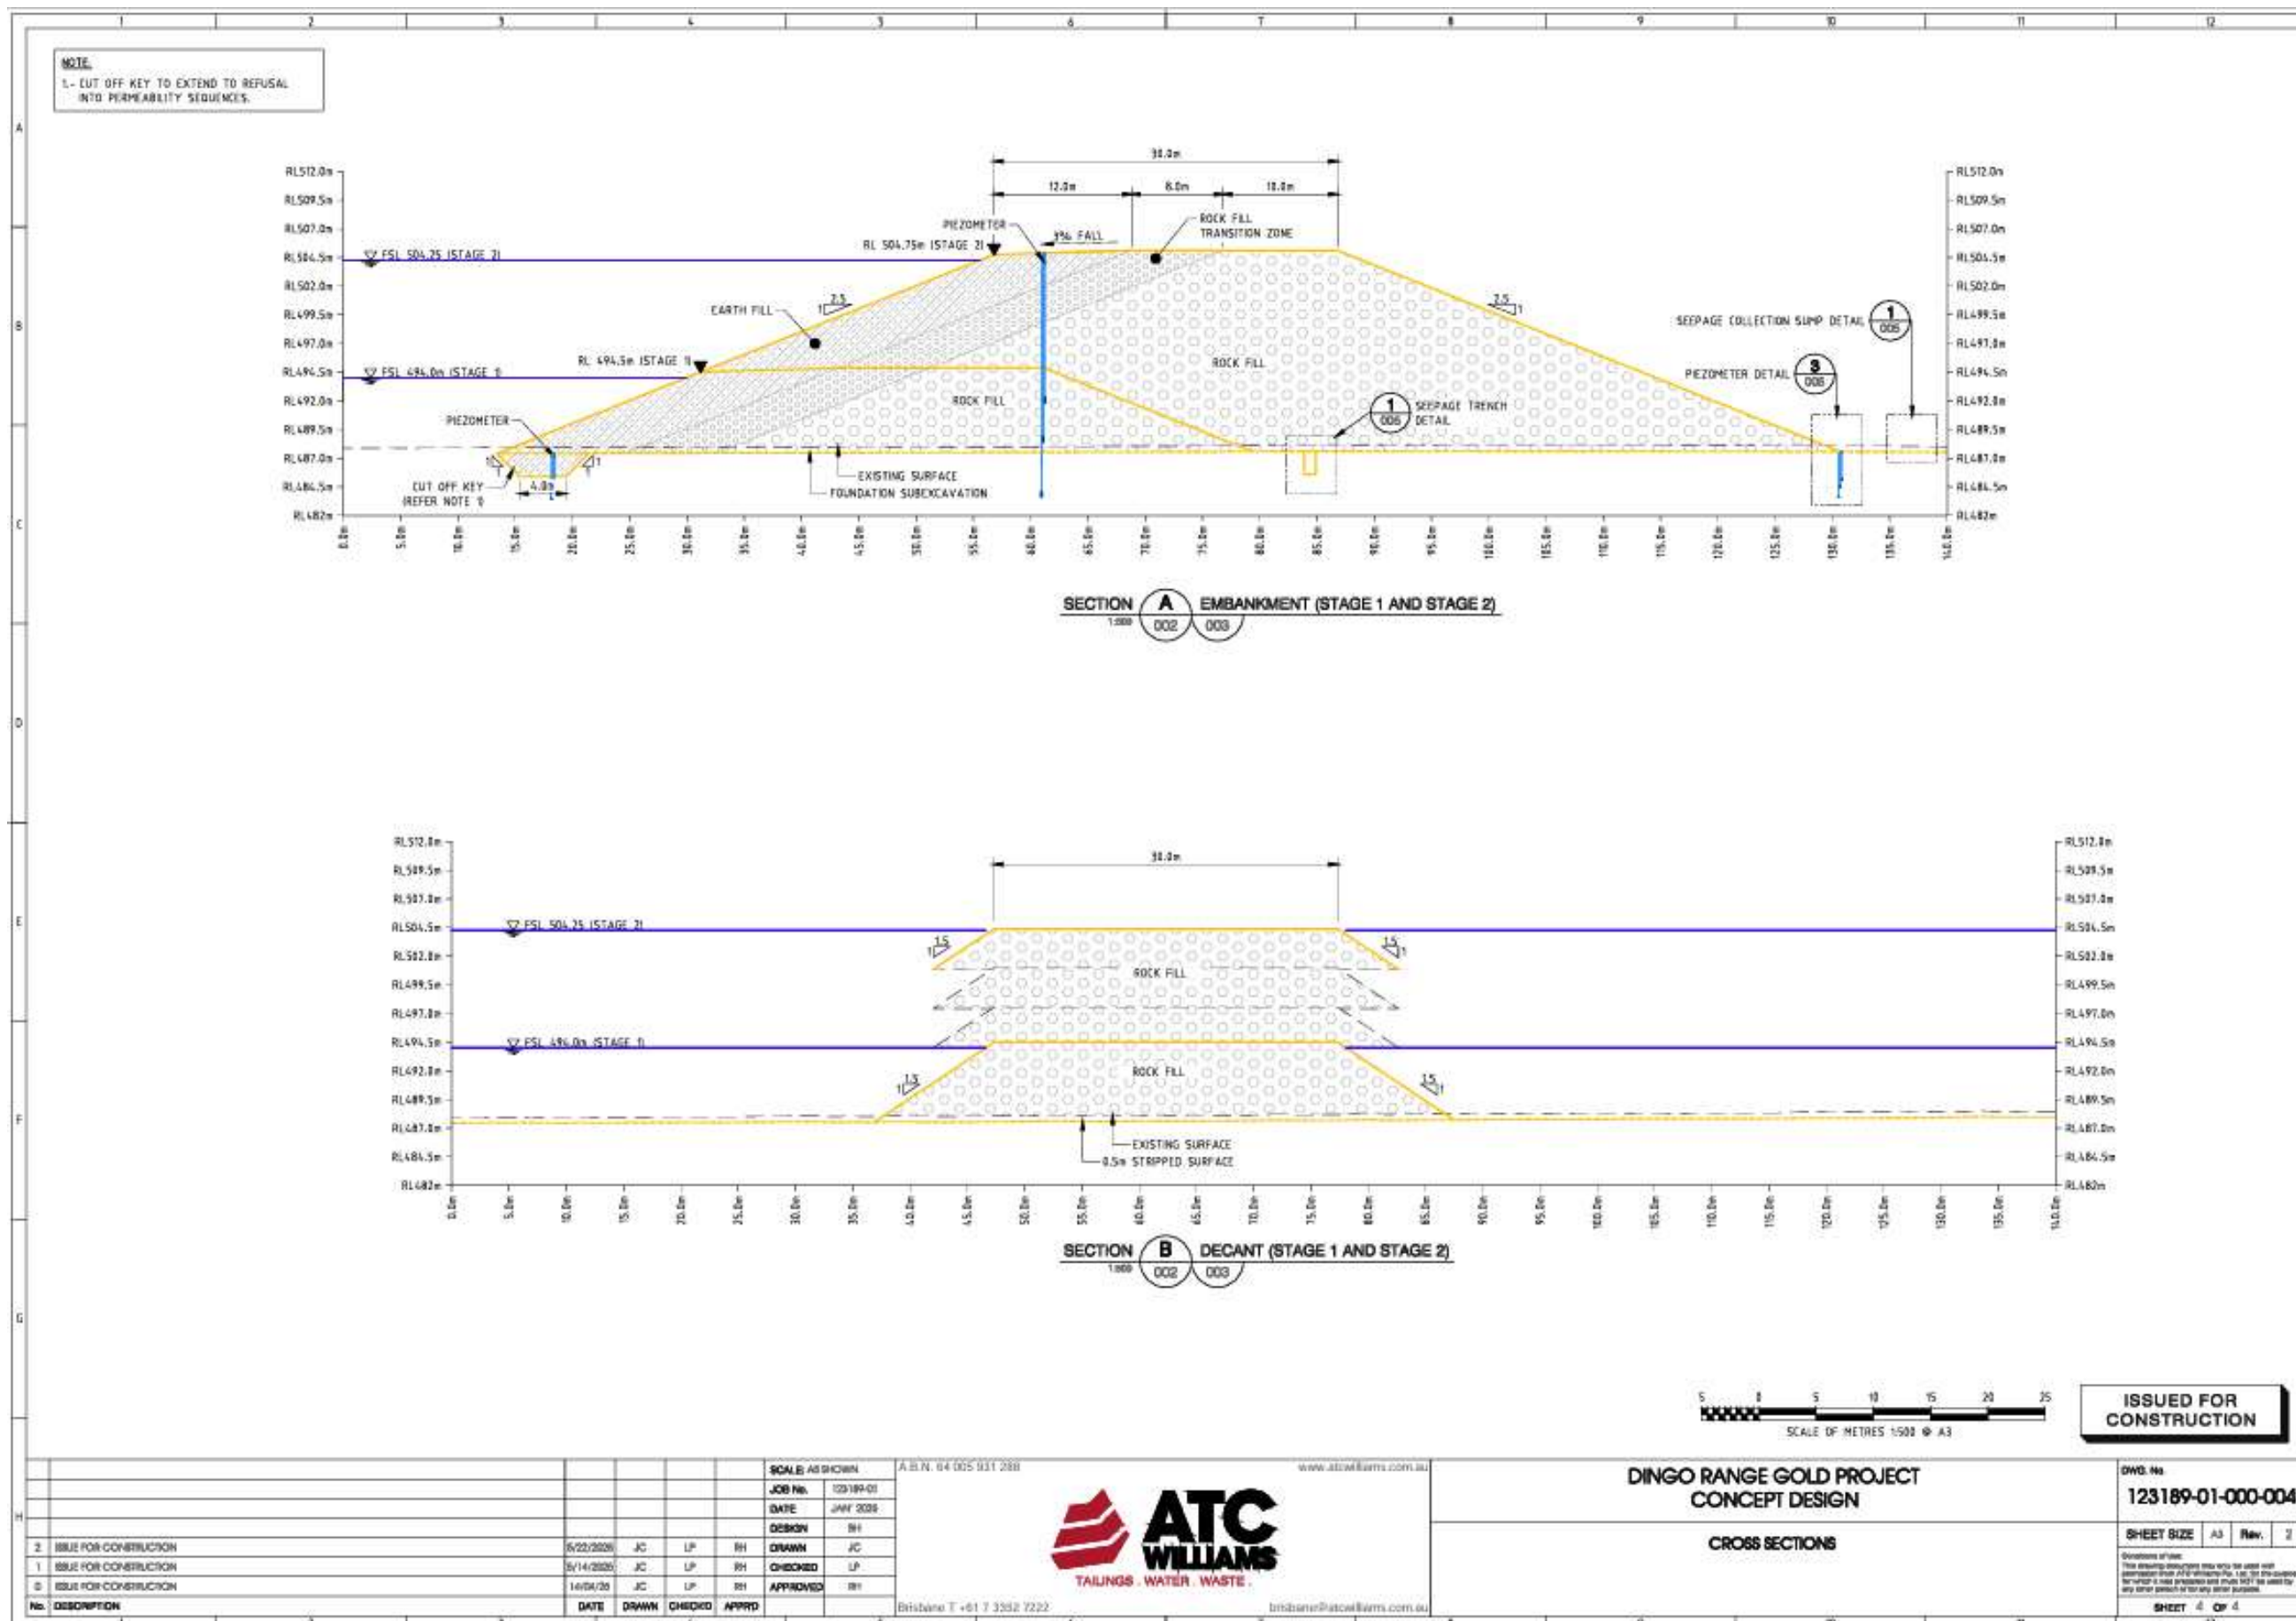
Dingo Range Tailings Storage Facility embankment cross-sections
